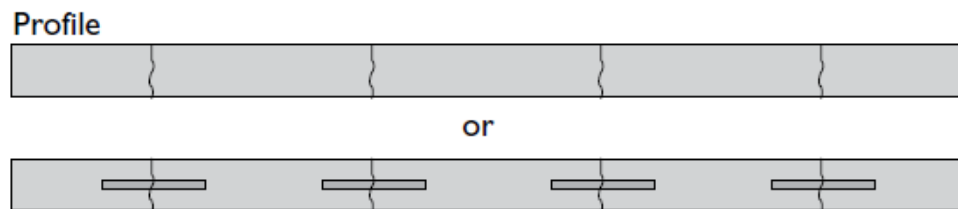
Jointed Unreinforced Concrete Pavements (JUCP) (Delatte 2008)
